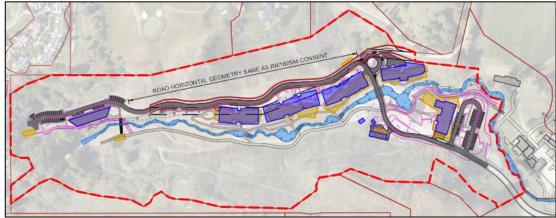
Plan showing proposed development (blue) overlain over consented Hotel development (orange).
